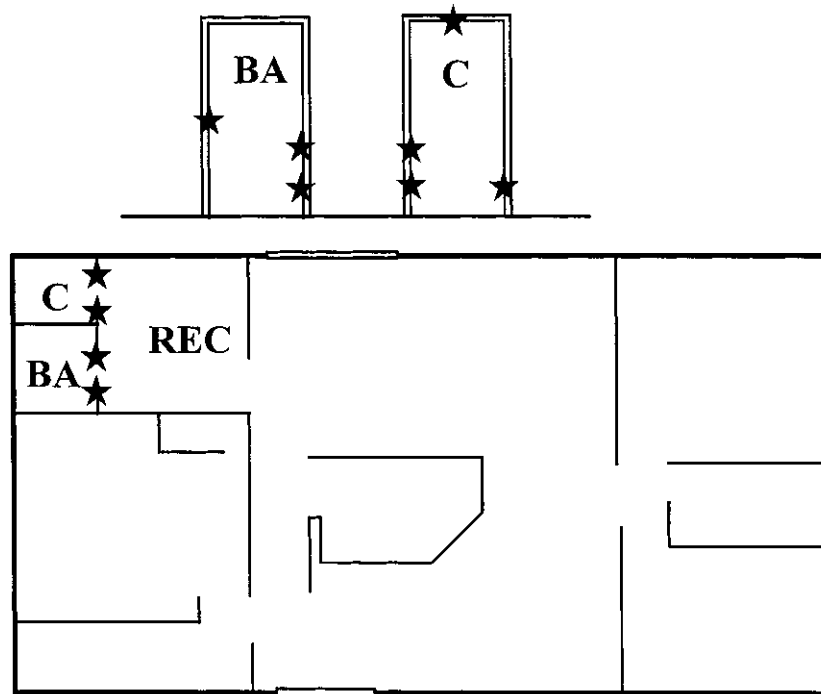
Floor plan of single-story Home. Stars show placement sites of bait stations on door trim of the bathroom (BA) and closet (C) in the recreation room (REC).
